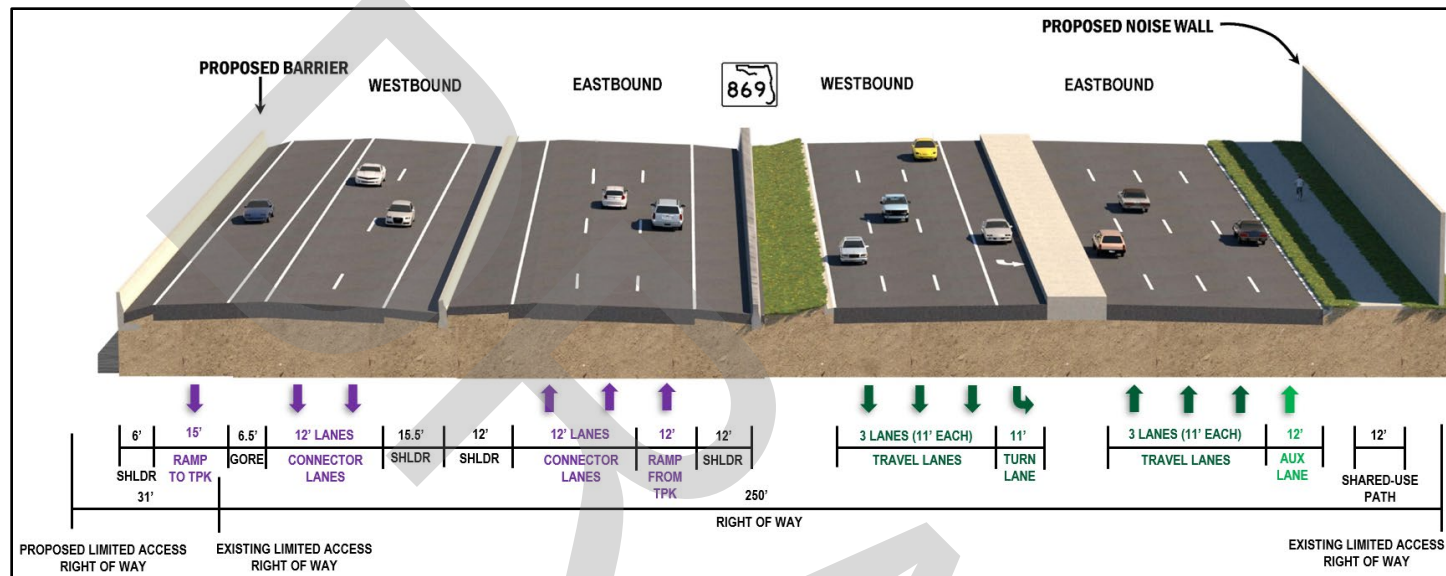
Preferred Alternative Roadway Section between Florida's Turnpike and Powerline Road
